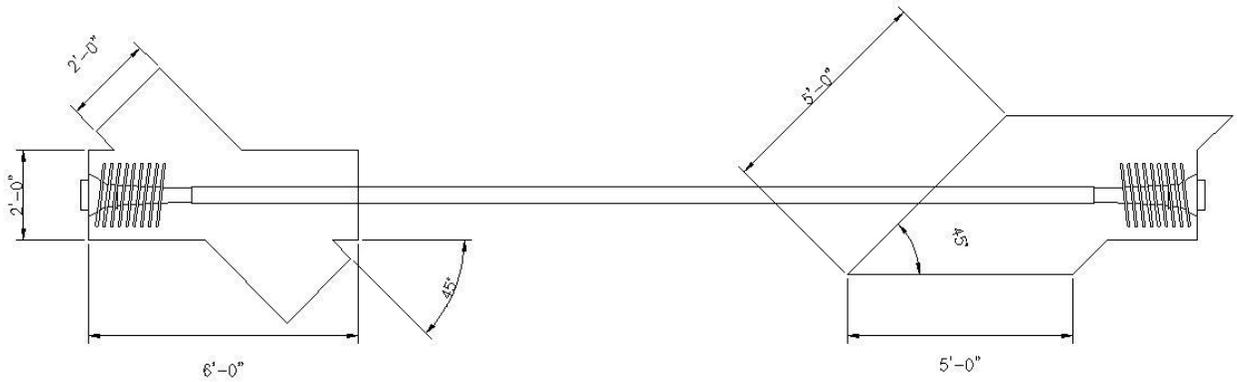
Stay Cable Mock-Up Specimen Plan View
